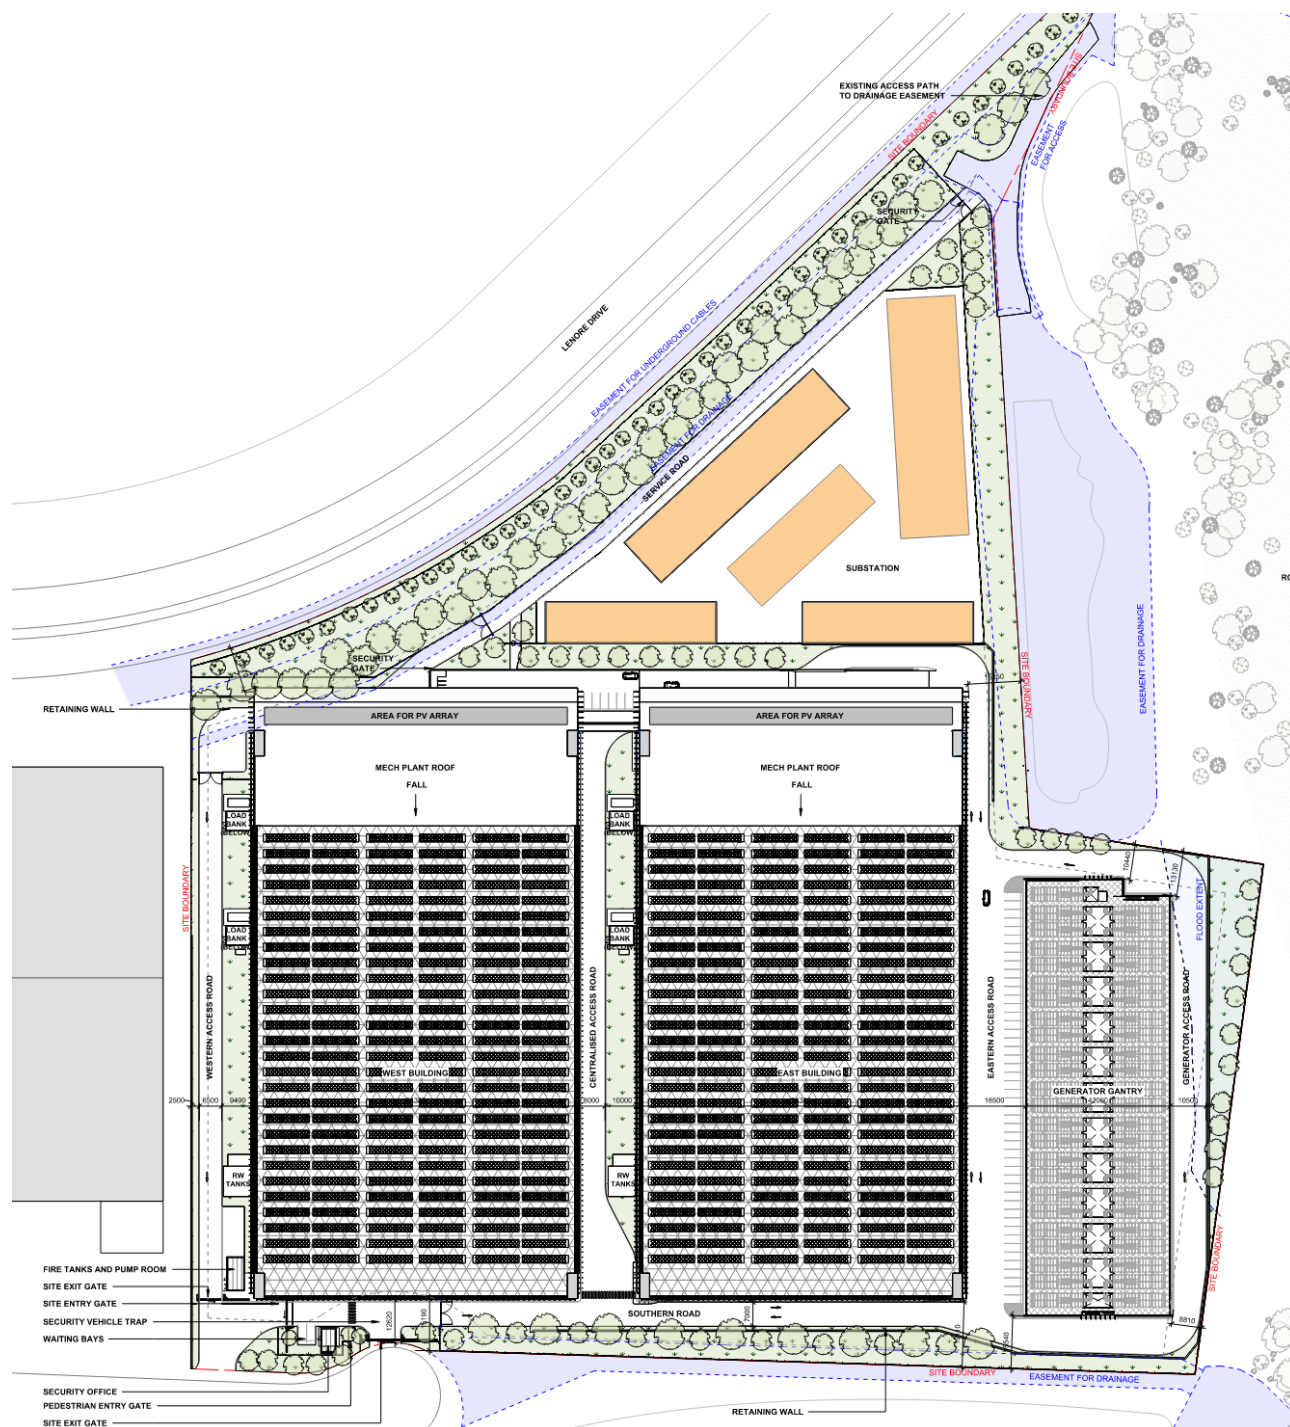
Proposed Layout for 78 Lockwood Road Data Centre
